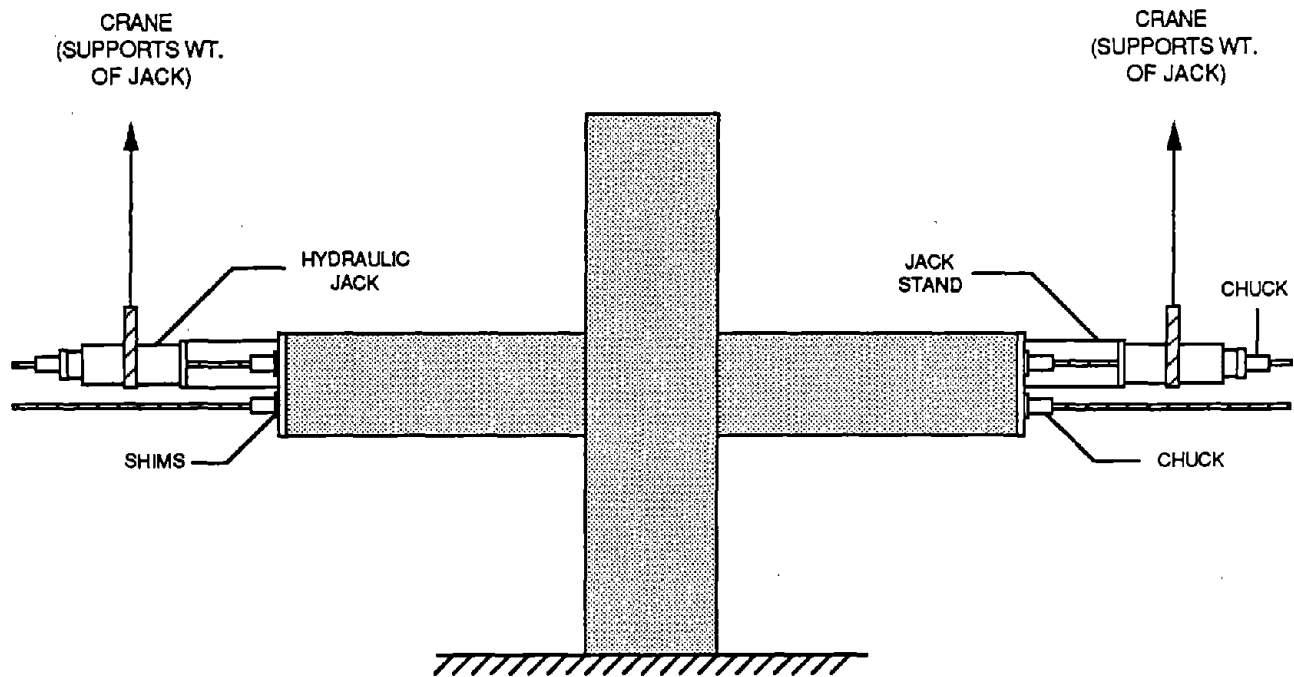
Set-up for post-tensioning precast concrete Zone 2 specimens.
